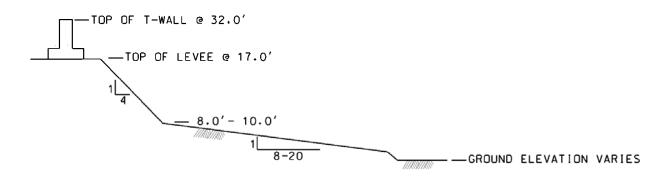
Typical Levee Design Cross-section MRGO Levee/Floodwall Combination (SB11)
